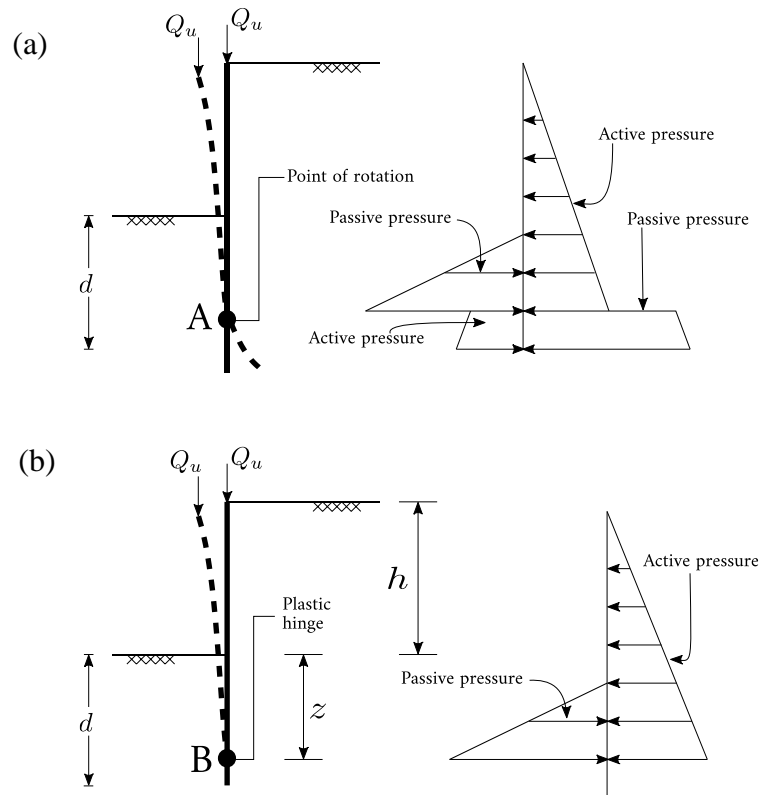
Failure modes of cantilever sheet pile walls: (a) Failure due to rotation about point A and (b) Failures due to the form of a plastic hinge at point B.
